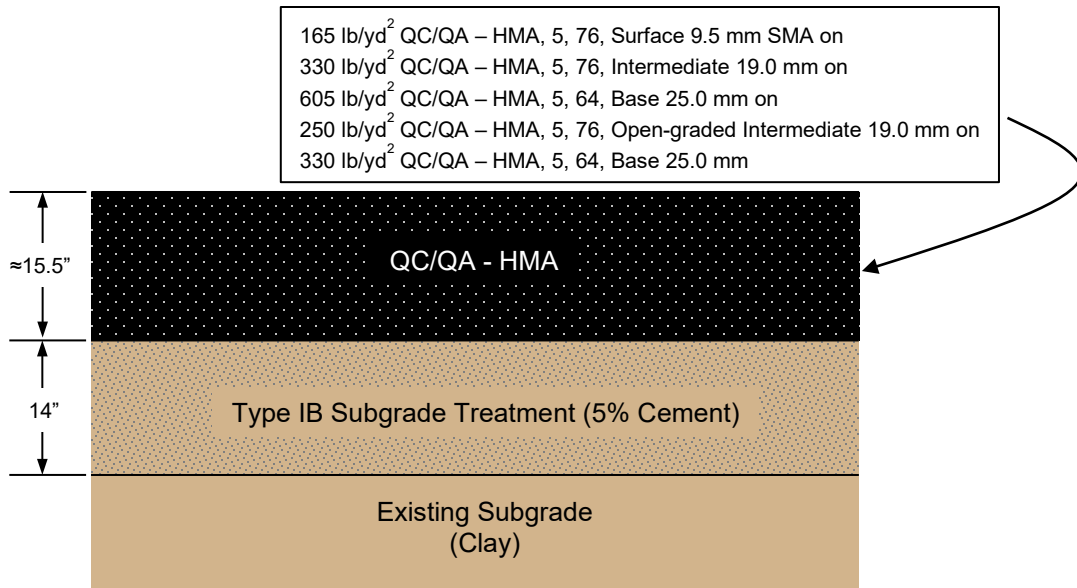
I 469 test sections No. 1 and 2 pavement cross section.
